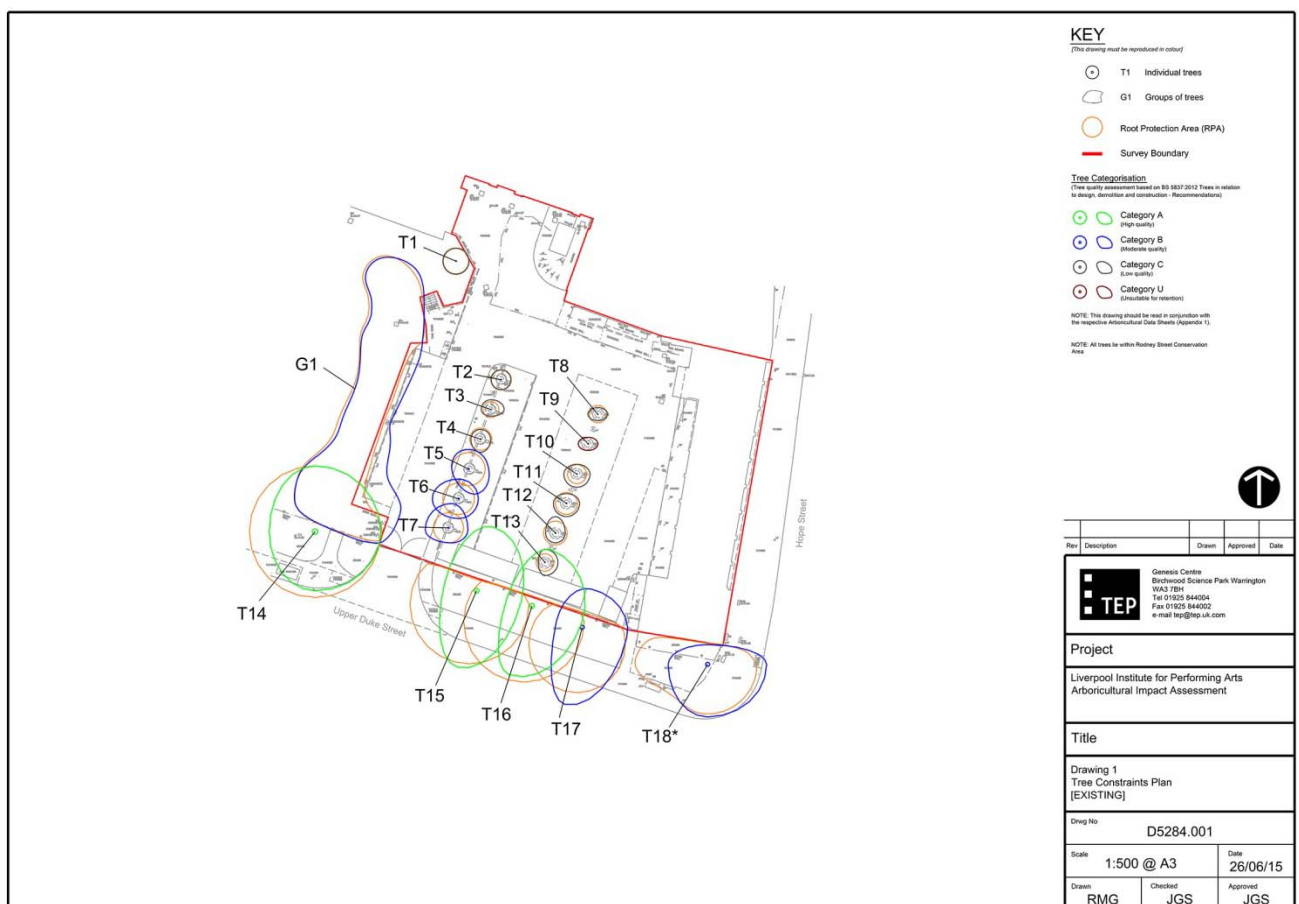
Tree Constraints Plan D5284.001, prepared by TEP
